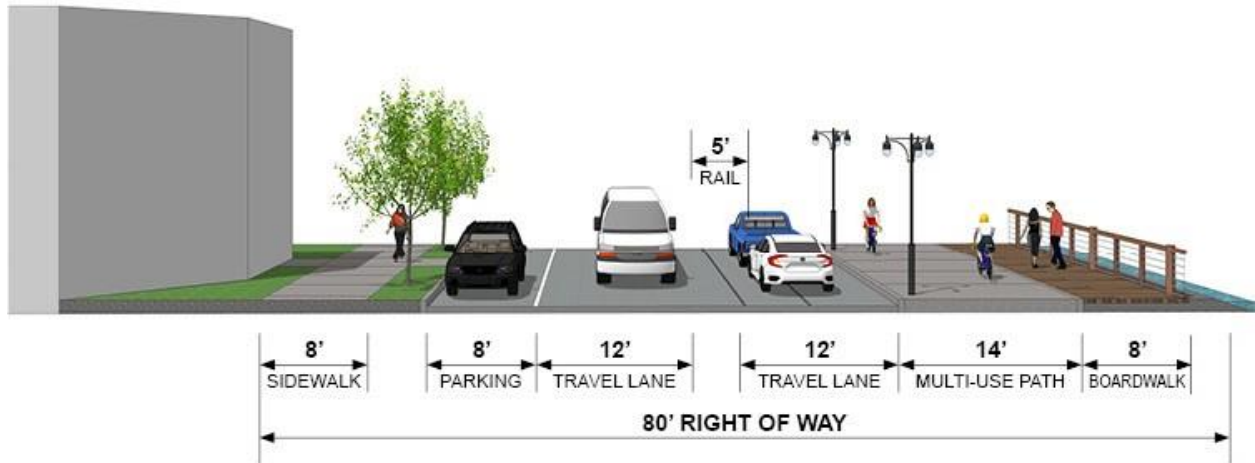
Alternative 1 - Proposed Section A (North of Date Street)
